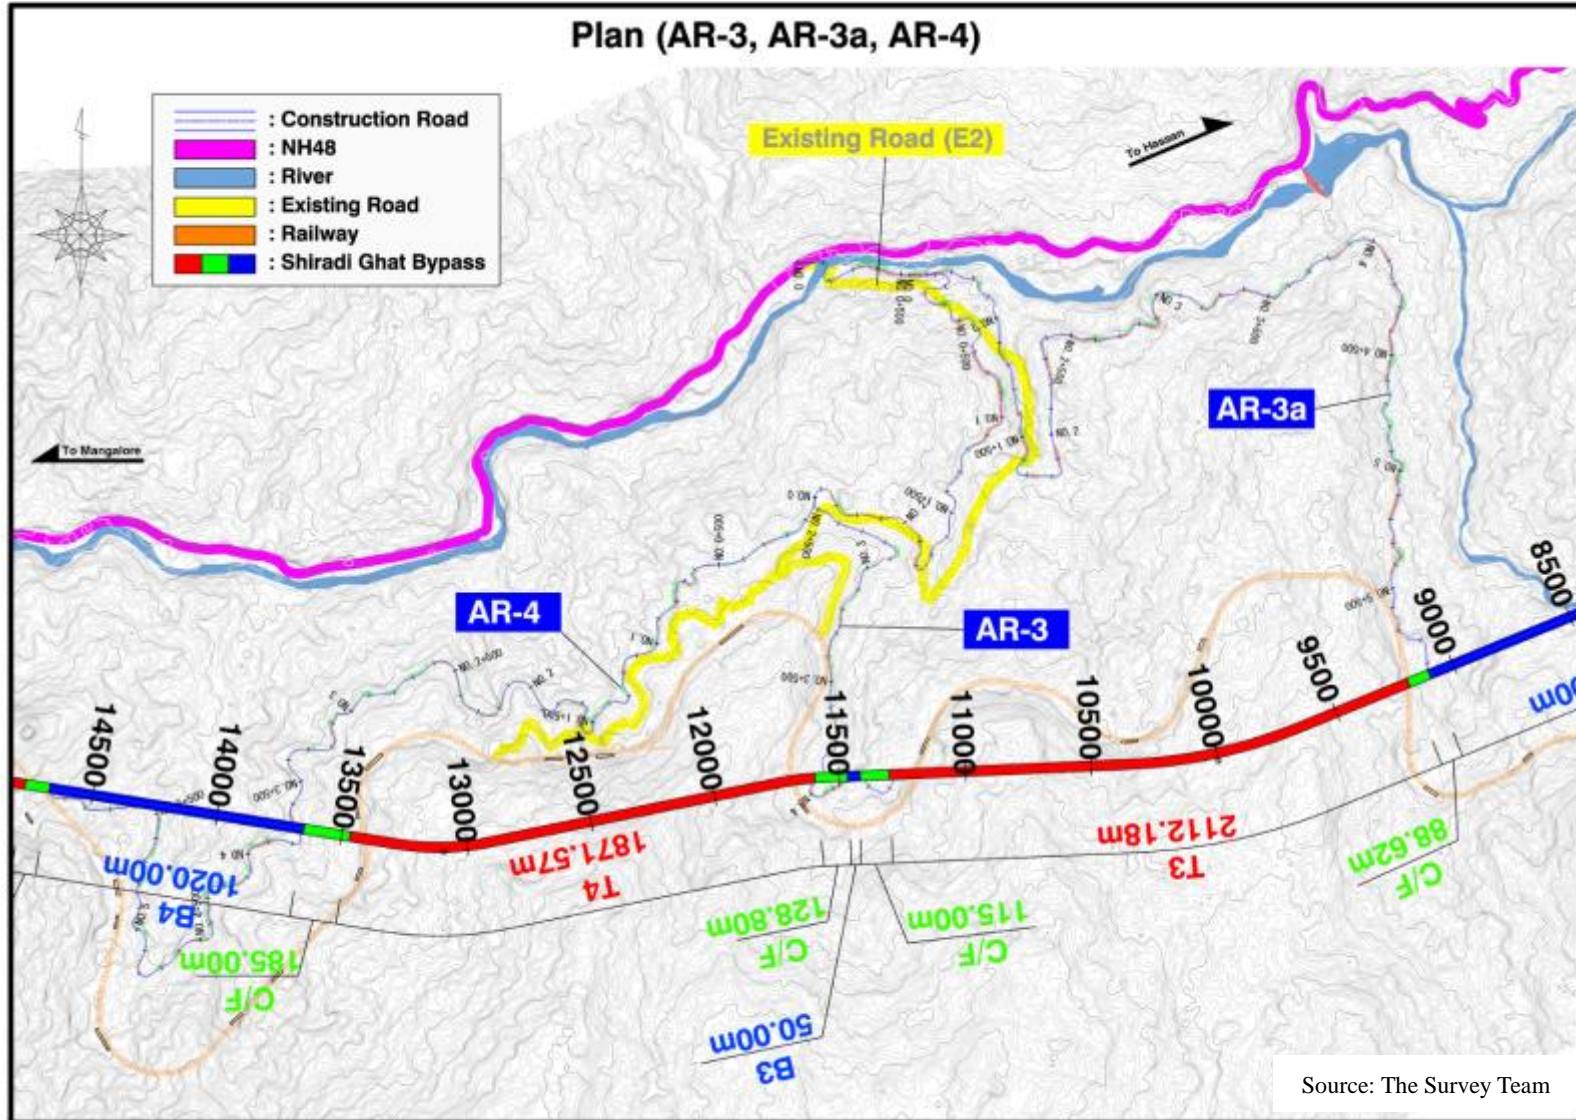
Plan of Construction Road (AR-3, AR-3a, AR-4)
